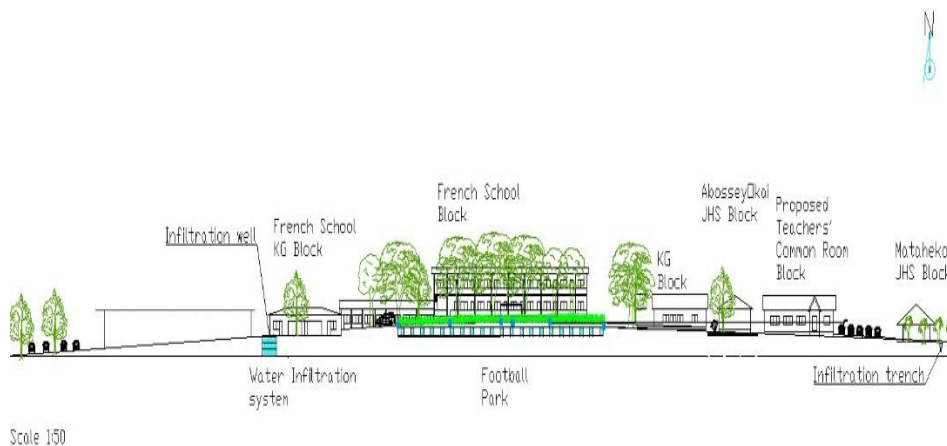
9: Detailed Drawing LLSite1 - Section AA
